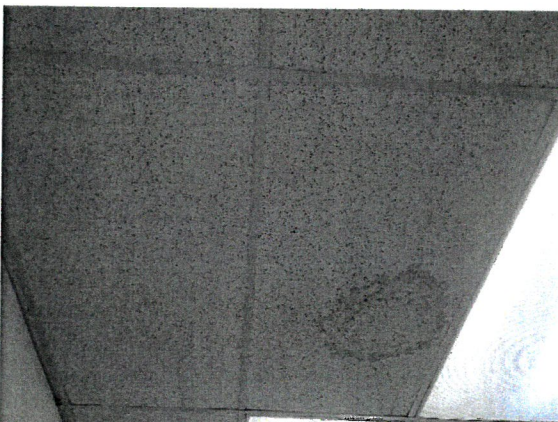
Ceiling Tile – Throughout Main Floor (ND)
